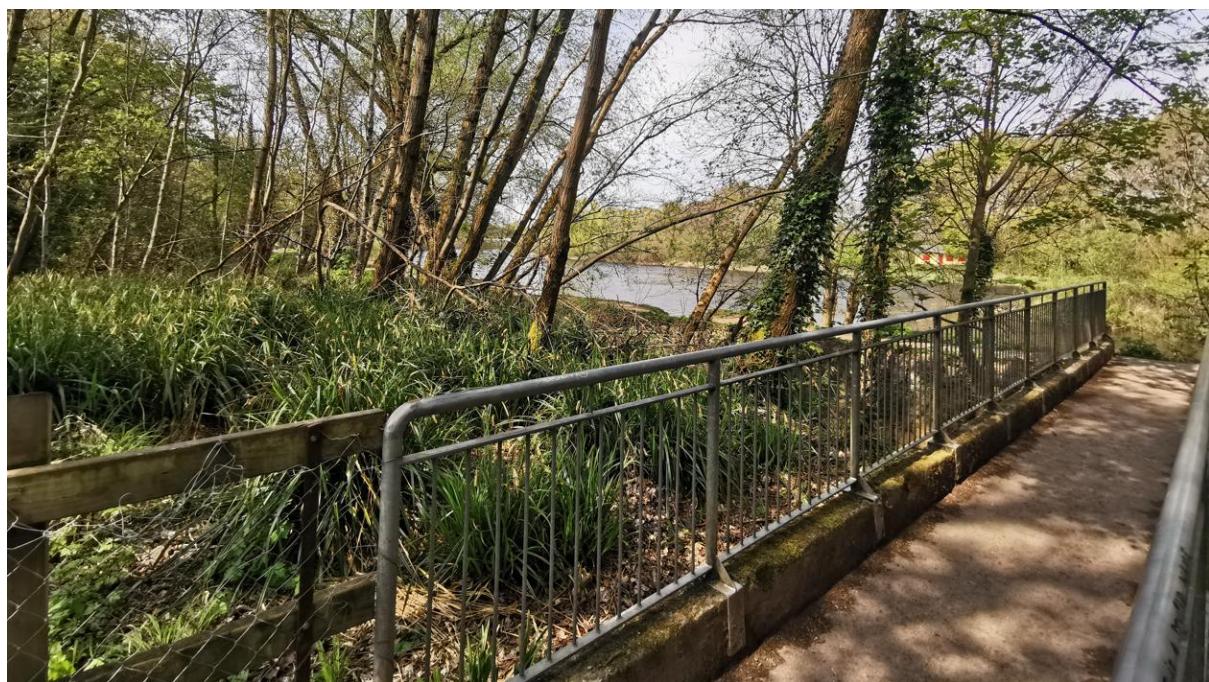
Existing concrete bridge at mouth of Plassey mill race with Plassey Beach in the background
